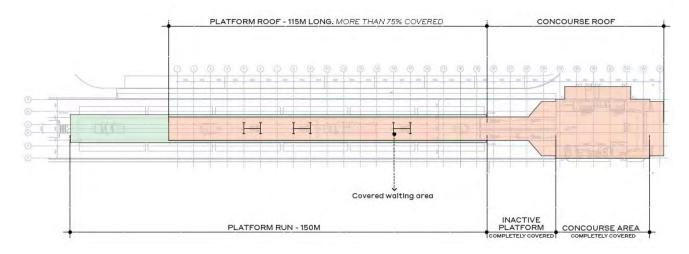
Ellenbrook Station Plan – Roof Coverage Extent
